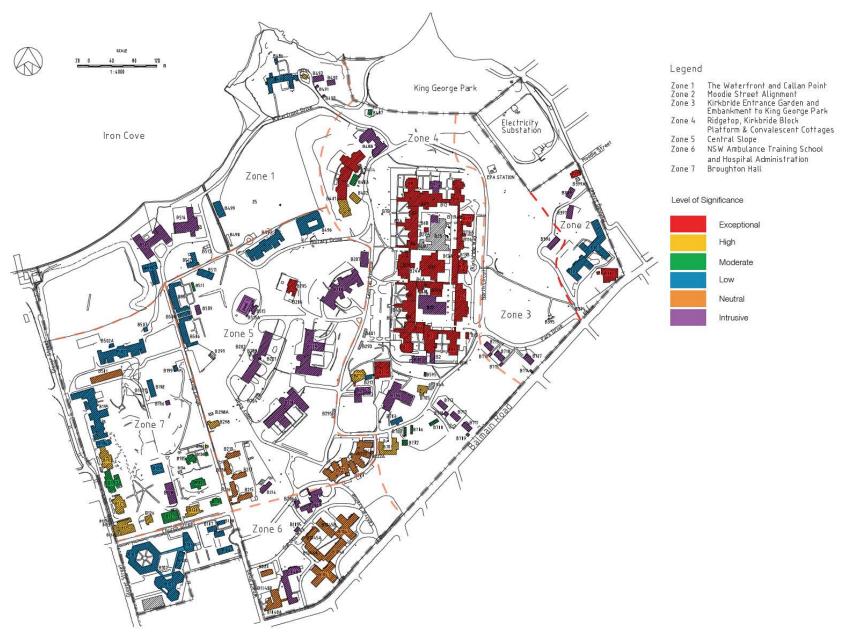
Site Plan showing Conservation Policies for Individual Buildings
